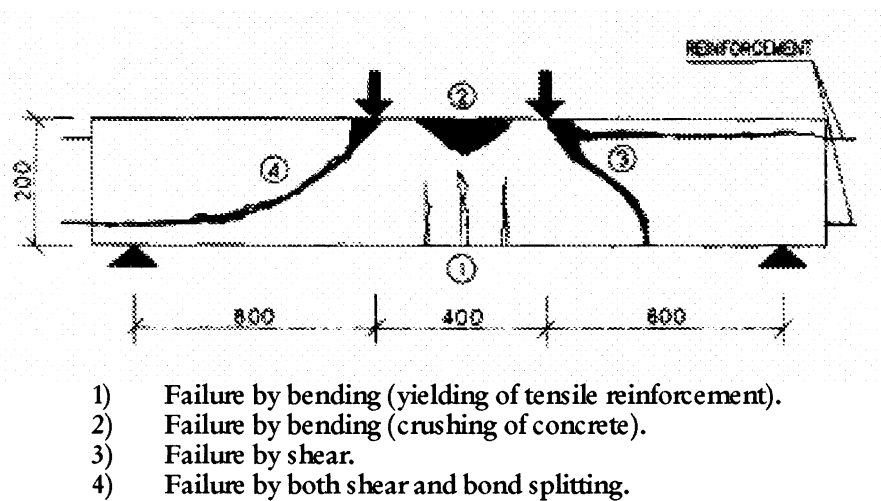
Illustration of types of failures of beams with corroded reinforcement (Rodriguez et al., 1997).
